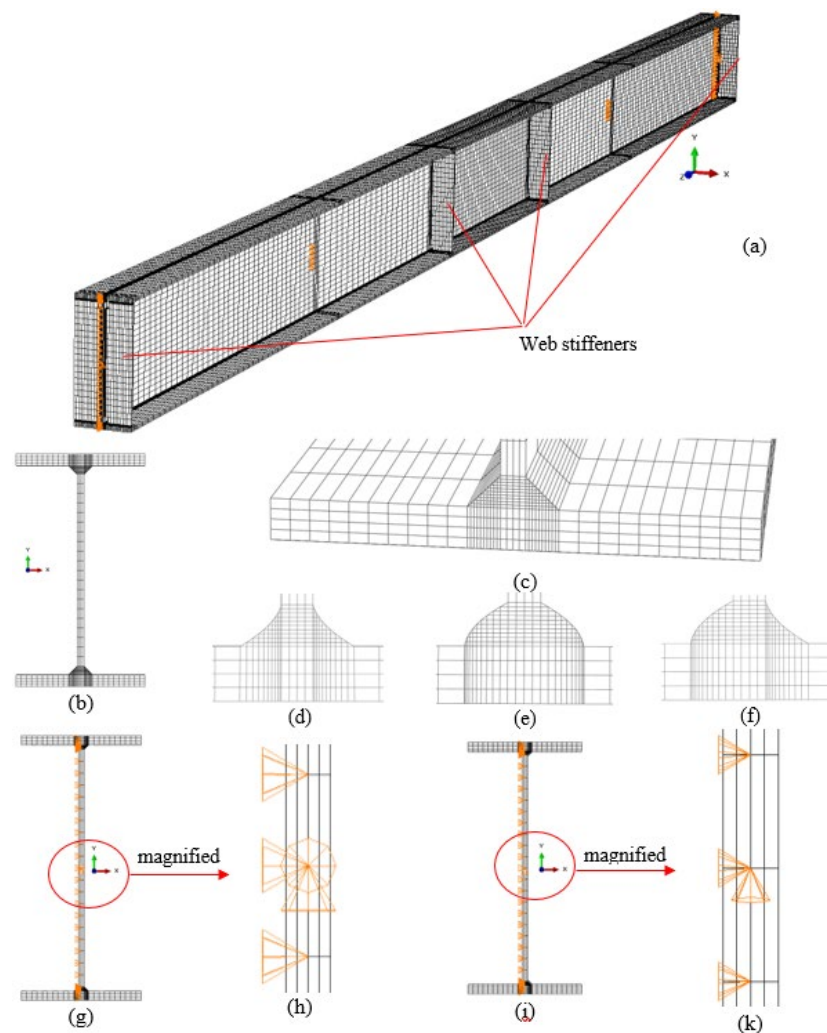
Mesh generations (a) 3D view, (b) cross-section view, (c) magnified 3D view of bottom flange with line weld shape, (d, e, f) concave, convex and mixed weld shapes, (g, i) pin and movable supports at Points A and B, and (h, k) magnified views of the pin and movable supports
